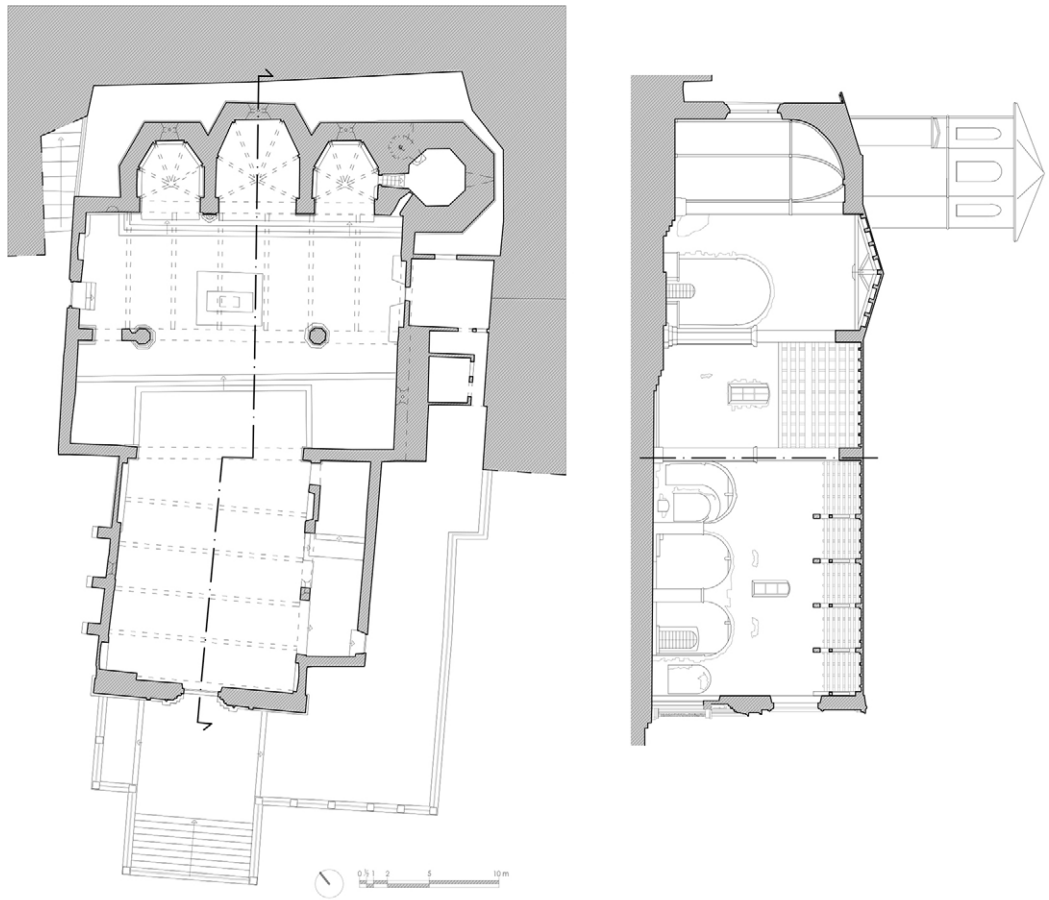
Plan and longitudinal section of the church. Elaboration by the authors.
